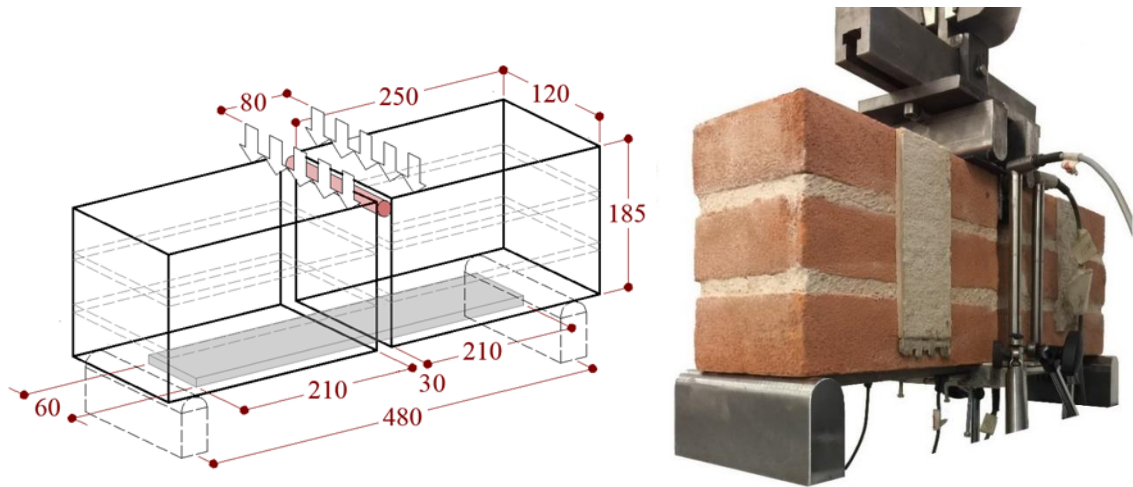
Three-brick modified beam test set-ups geometries and dimensions (mm).
